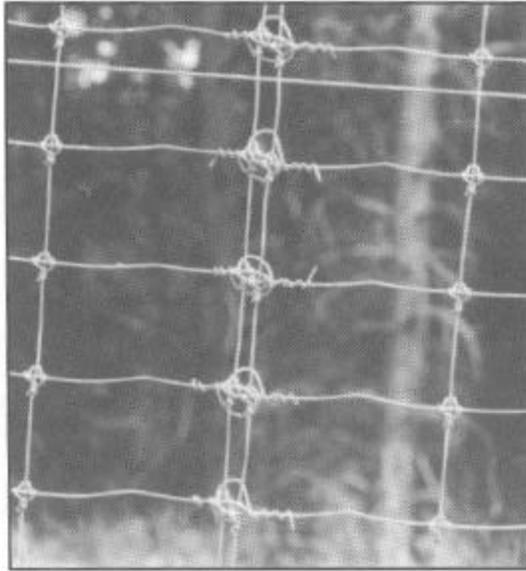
Spliced section of New Zealand Tightlock fence; note location of splice near vertical stays.
